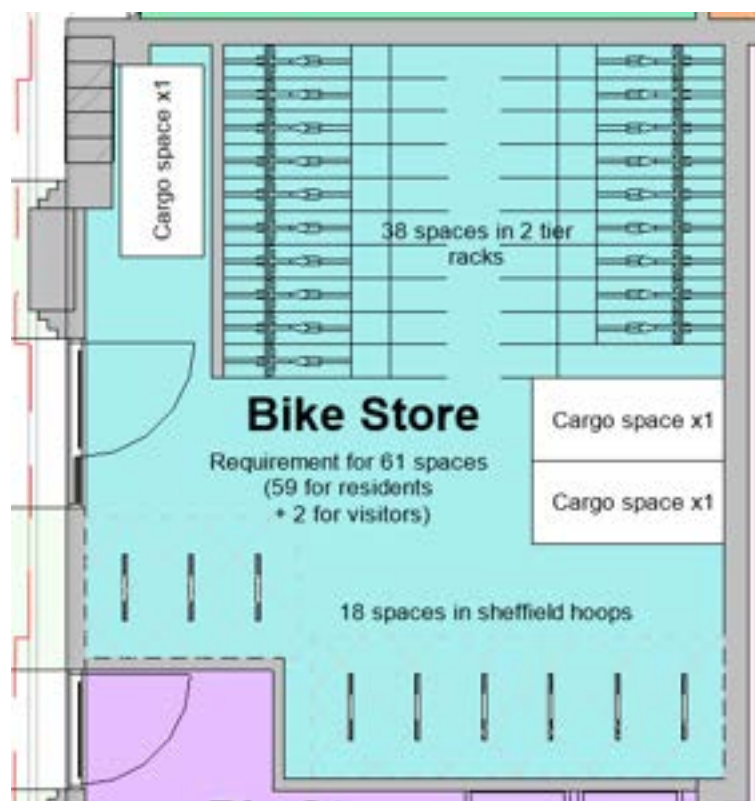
Layout of proposed Bike Store (not to scale)
